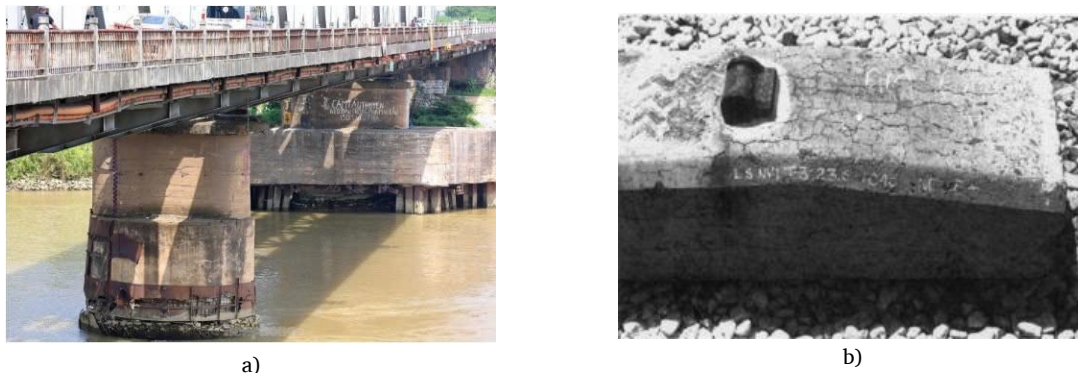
a) The railway bridge pier (Đuống Bridge – Hanoi) has deteriorated 15 years after its repair;
